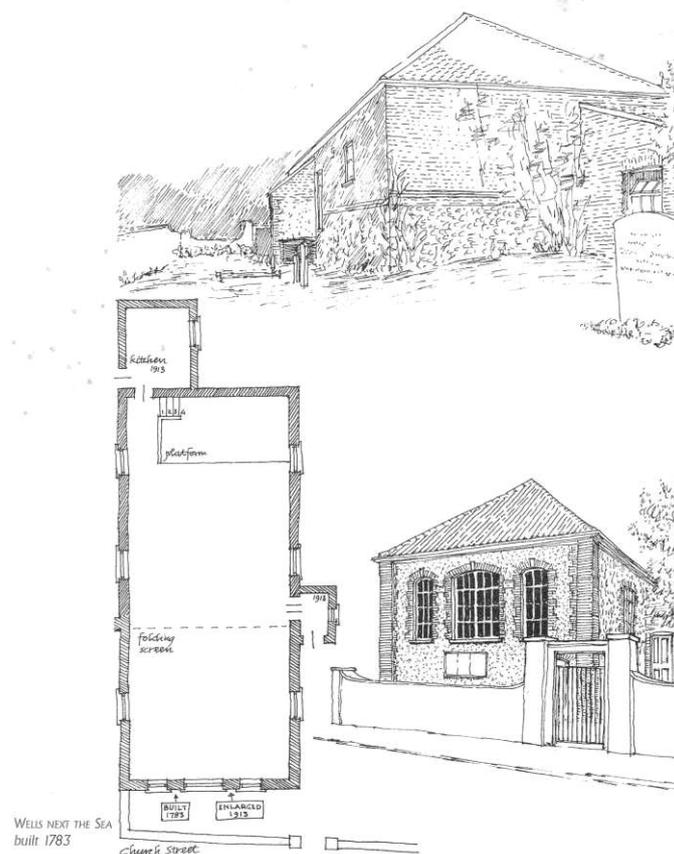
; Front and rear views of the meeting house and the ground floor plan in 1981, before the internal alterations of 1983 (Butler (1999), vol.1, p.460). North is at the top.
